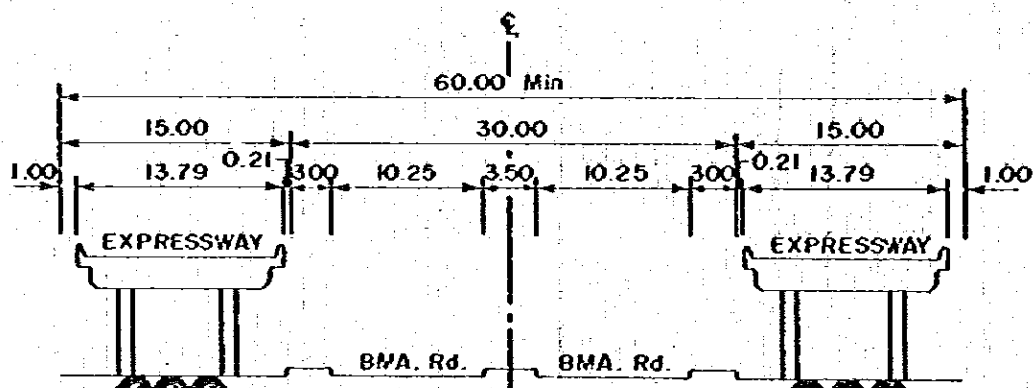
JOINT DEVELOPMENT PLAN (TYPE I) OF THE EXPRESSWAY AND BMA STREET WITHIN THE ROW
